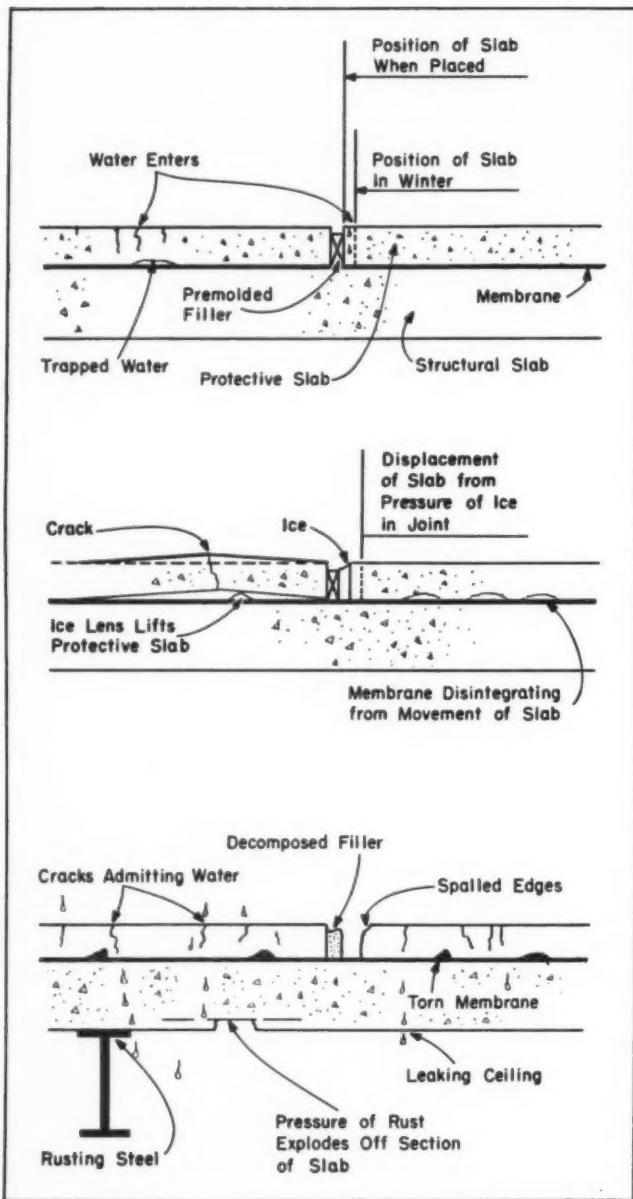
WHEN MEMBRANE WATERPROOFING IS USED ON PAVED DECKS, IT SHOULD BE PLACED BETWEEN SUPPORTING SLAB AND FINISHED SURFACE. DRAINS MUST BE INSTALLED TO AVOID ICE DAMAGE.
